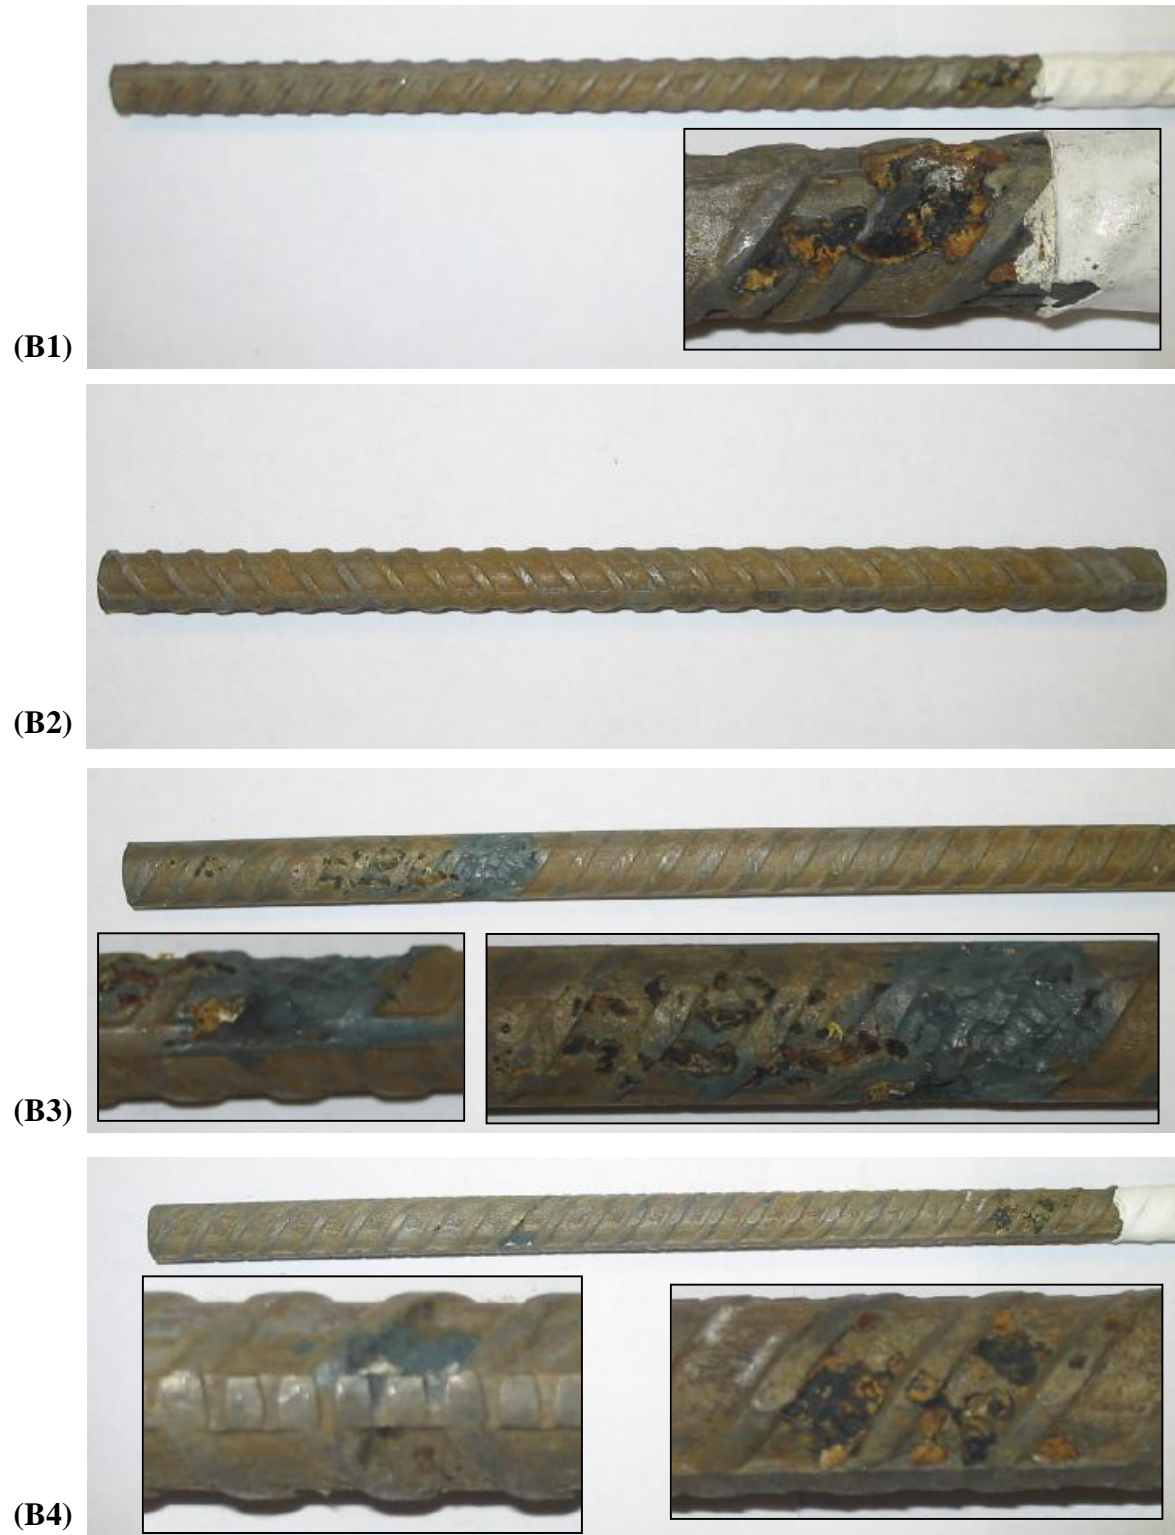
Steel segments after cleaning the corrosion products, removed from beam B.
